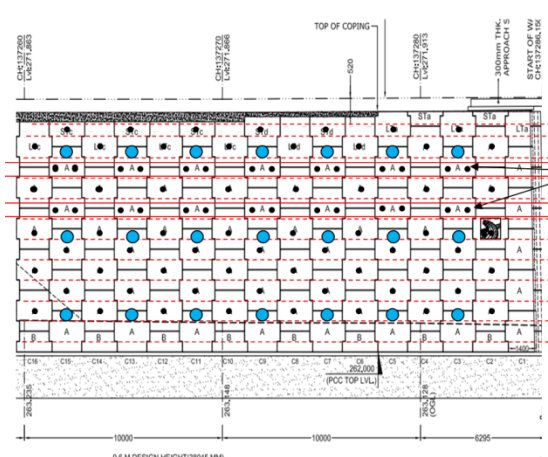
(b) Soil Nailing with drainage system as well as girder support were suggested as remedial measures
